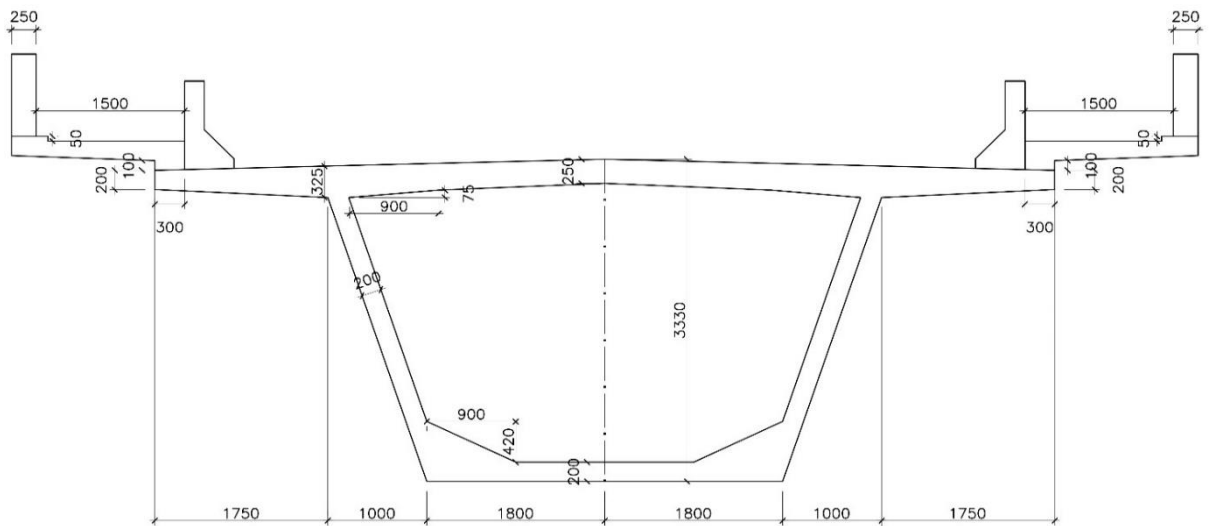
A Sectional View Single Cell Box Girder Bridge
